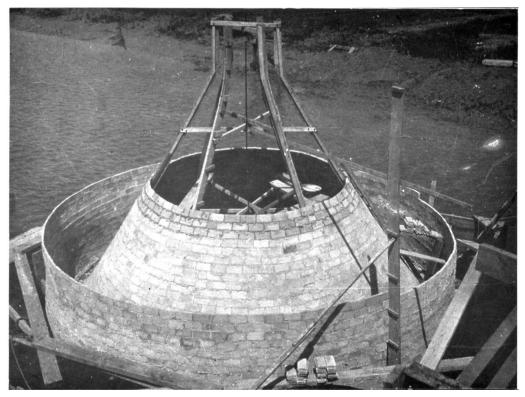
Eduardo Torroja using thin brick shells as form-work for the foundations of the Sancti Petri Bridge, 1927
